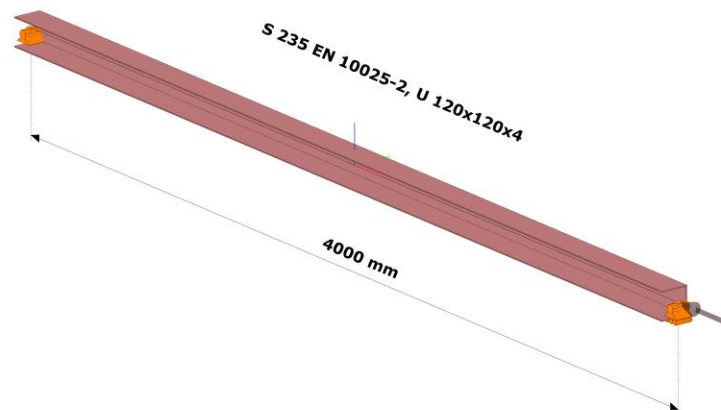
Simple fork supported member with cold-formed U section subjected to compressive force (FTB)
